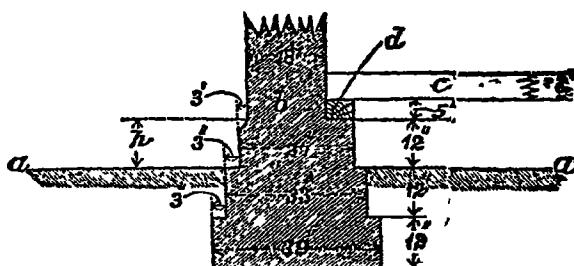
is a vertical section through a wall to show how the footings of the foundation are formed. a, a shows the ground surface, b is the wall, c a floor joist, d the wall plate on which the floor joists rest. The height of the plinth is p: the outer surface of the plinth is weathered. (Scale = $\frac{1}{60}$.)
